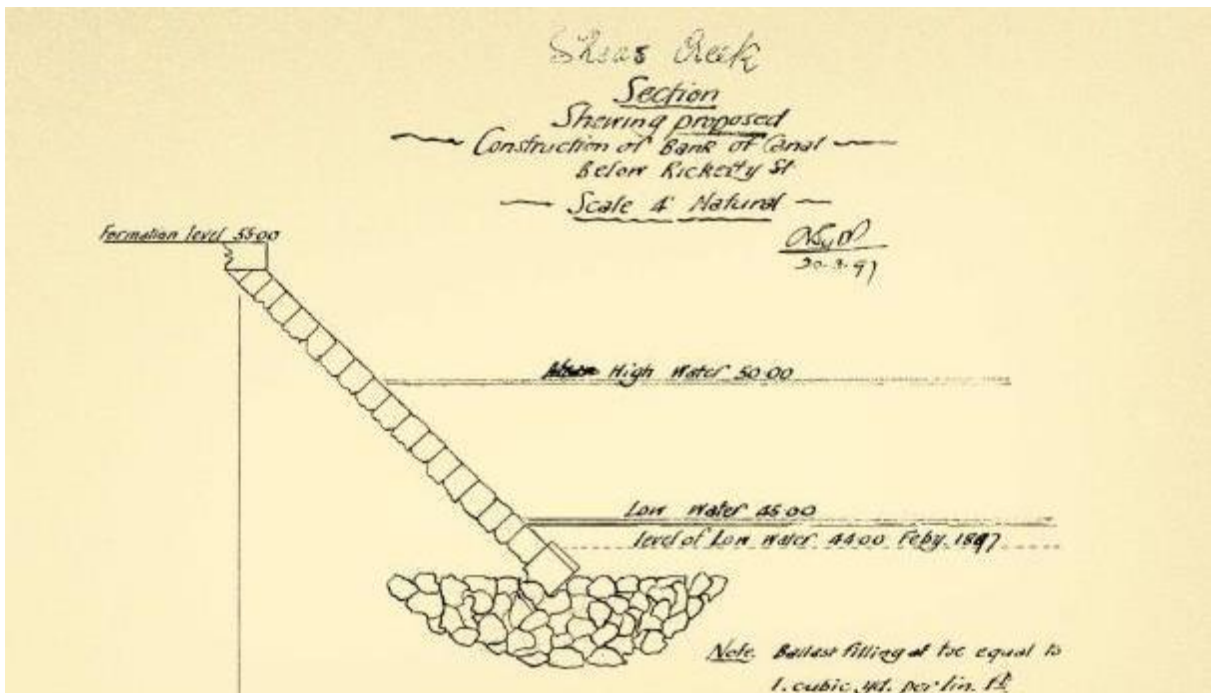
Alexandria Canal Wall cross section diagram Source. Sydney Water.
